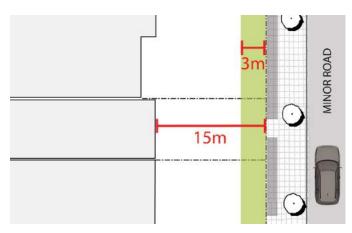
On minor roads there should be a 15m front building setback from the property boundary with a 3m (minimum) landscaped strip.
